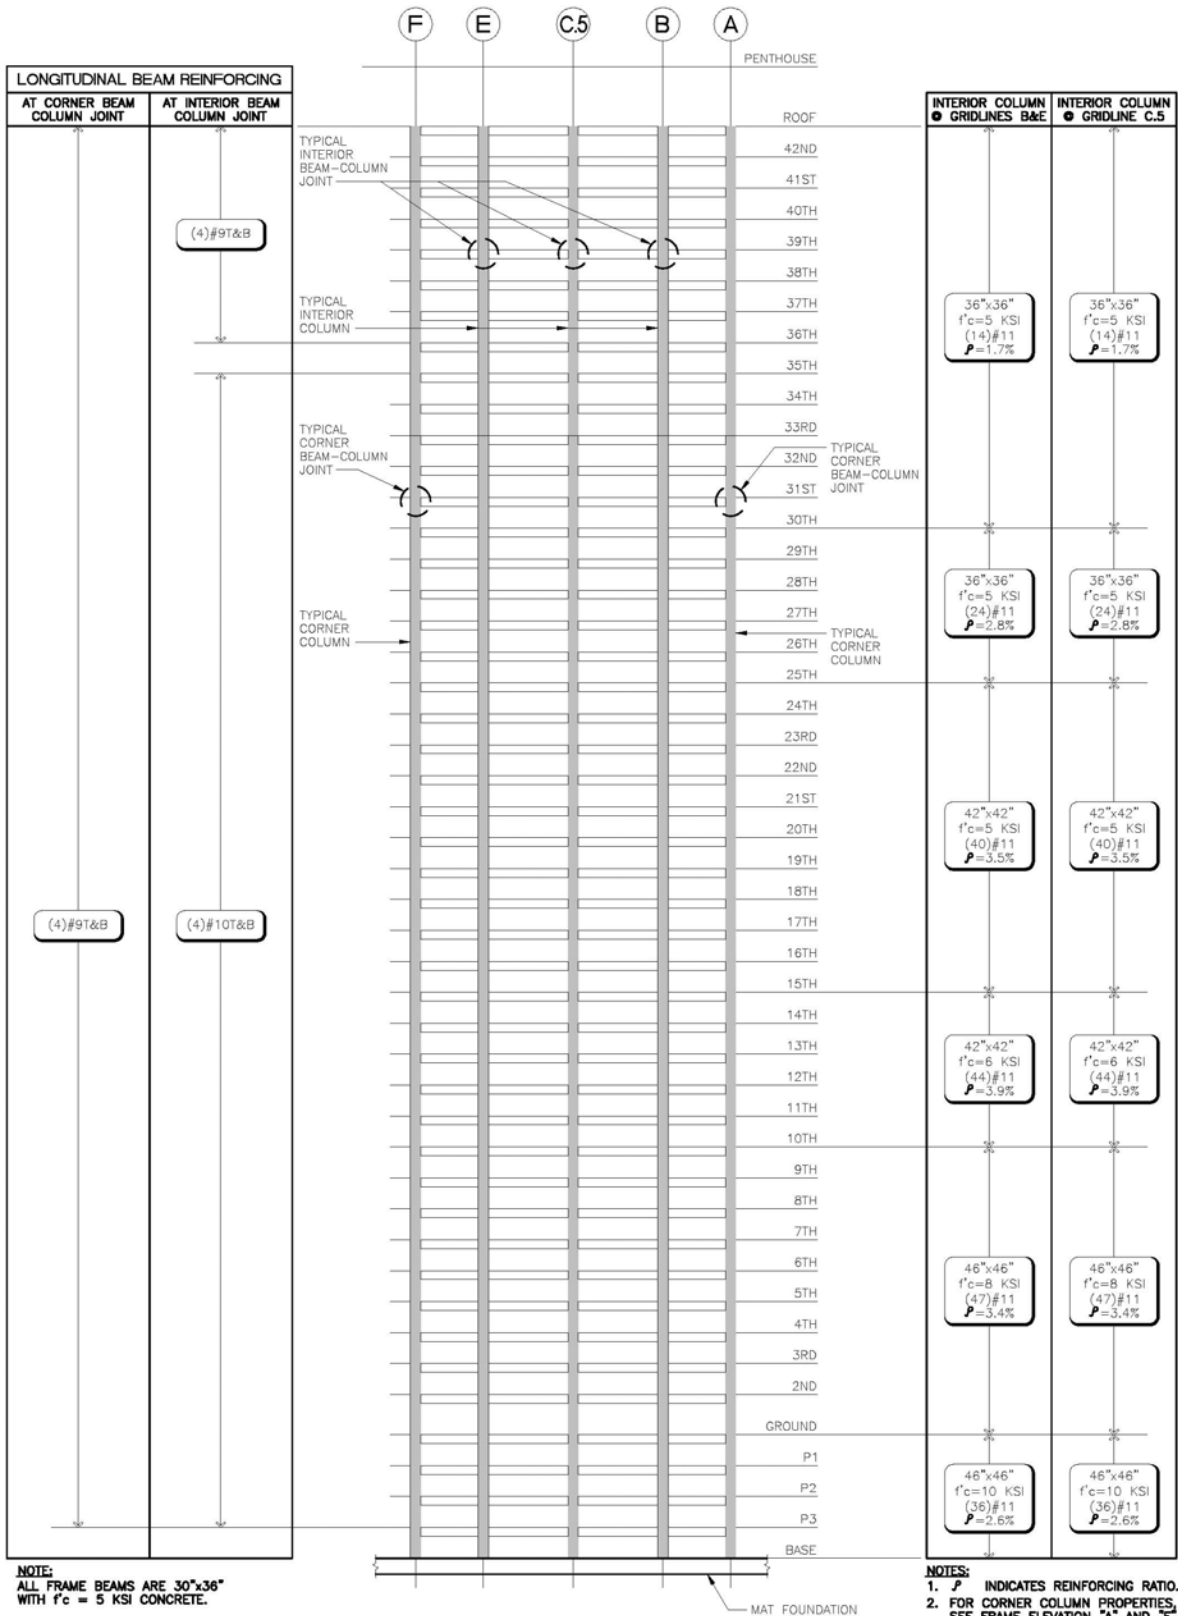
Elevation and properties of frames 2 and 5 for building 2B
